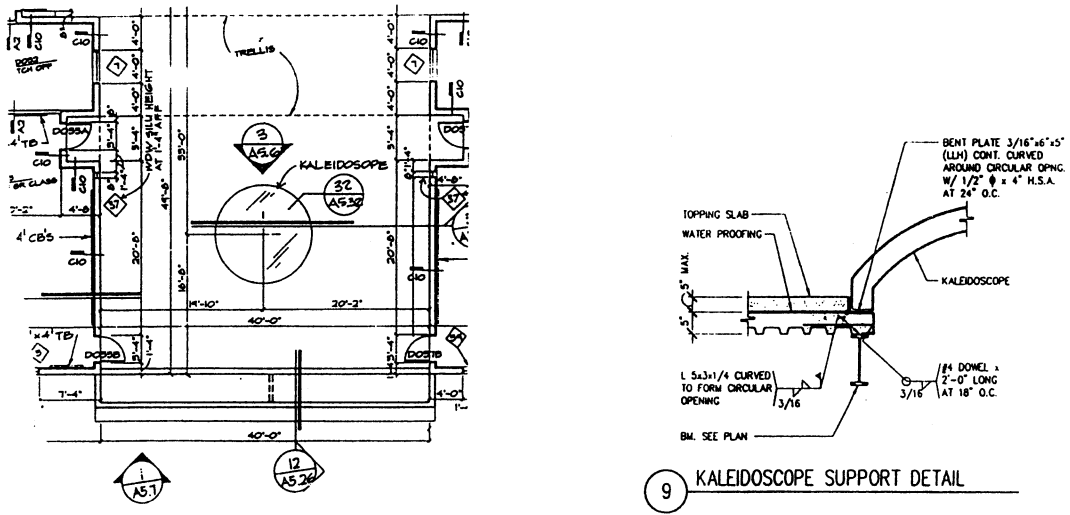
Ventana Vista Elementary School. Kaleidoscope: CD architectural plan and structural section
